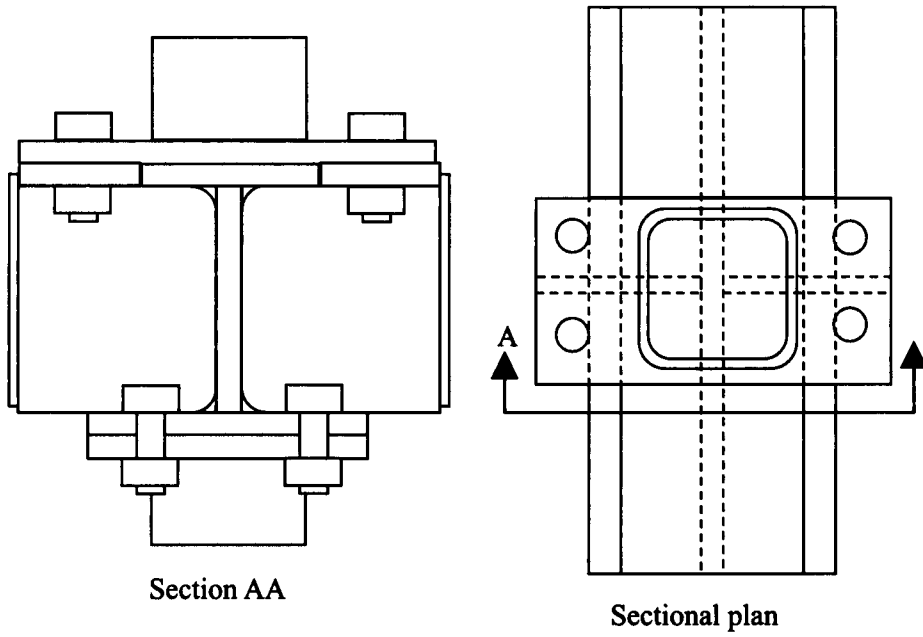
Typical beam-column connection for plastic rotations in the beam
